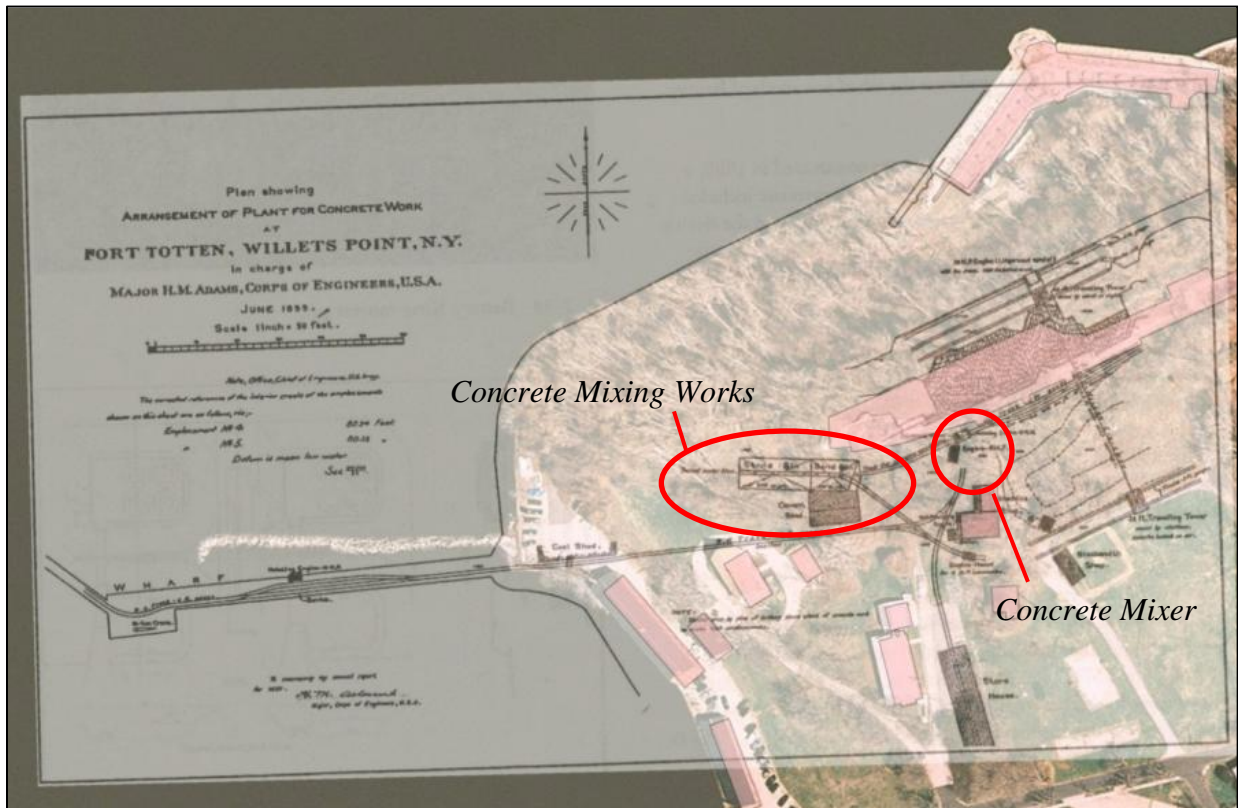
Plan showing arrangement of Plant for Concrete Work at Fort Totten, Willets Point, NY June 1899. Plan accompanying Annual Report of the Chief Engineer 1899 (NARA, RG77, Drawer 35, Sheet 60, georeferenced against the 2009 aerial photograph and buildings dataset, New York City Department of Buildings)
